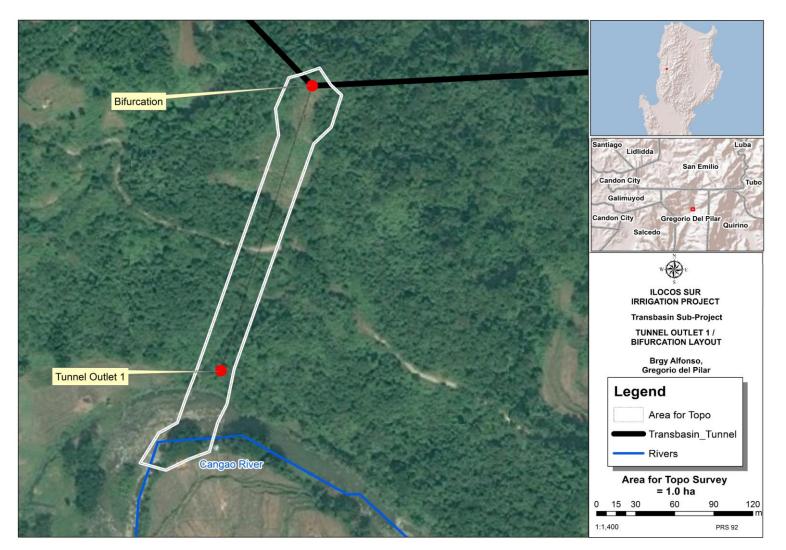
Tunnel Outlet 1 - Bifurcation Layout
